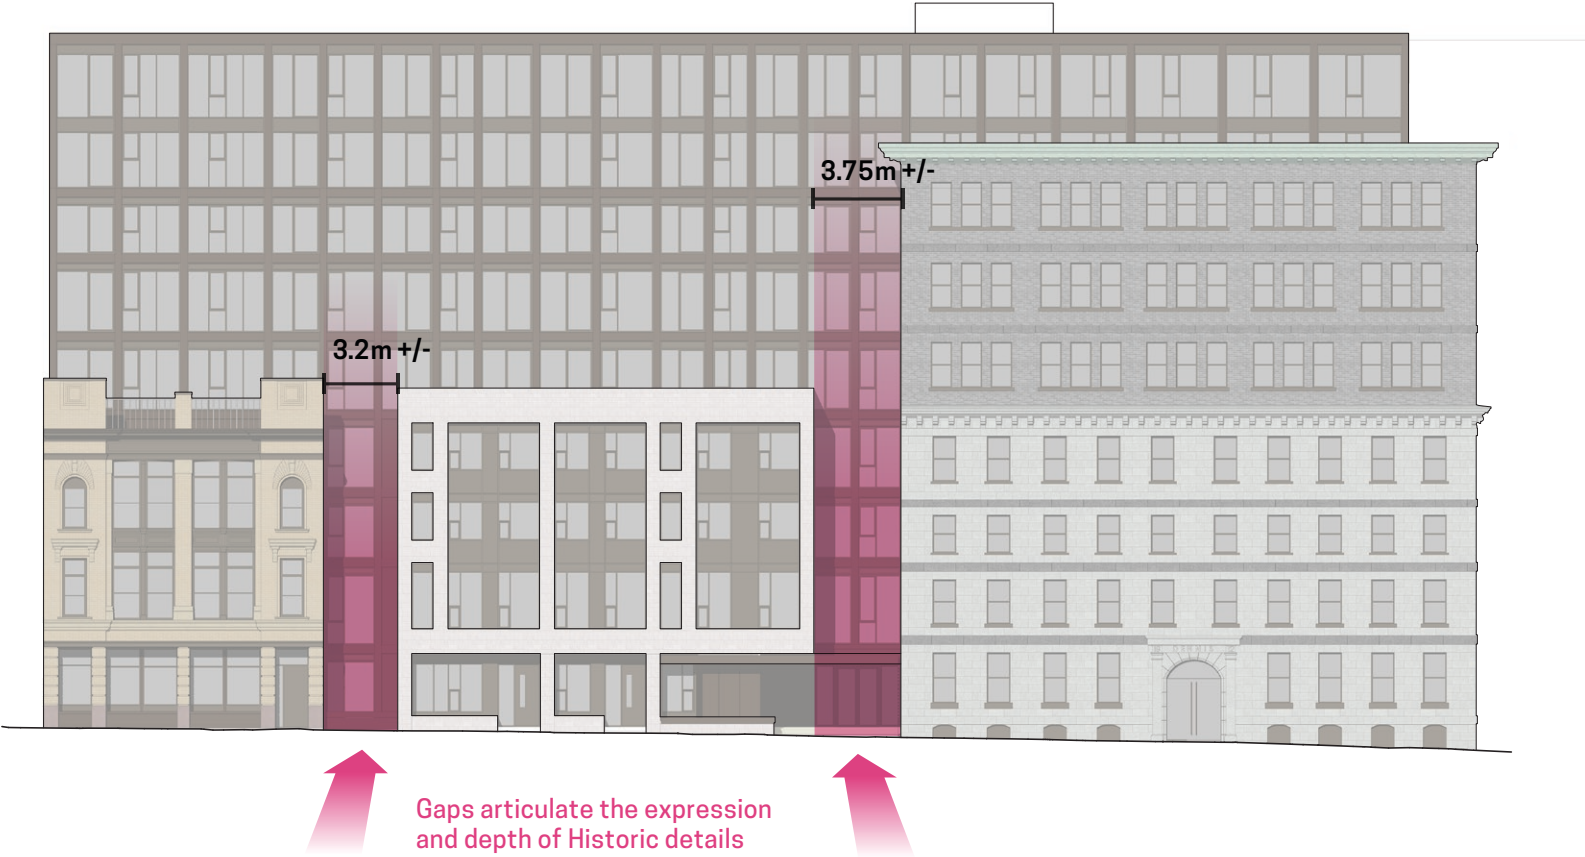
c Streetwall Width: New construction gaps on Granville to maintain visual prominence of heritage resources
